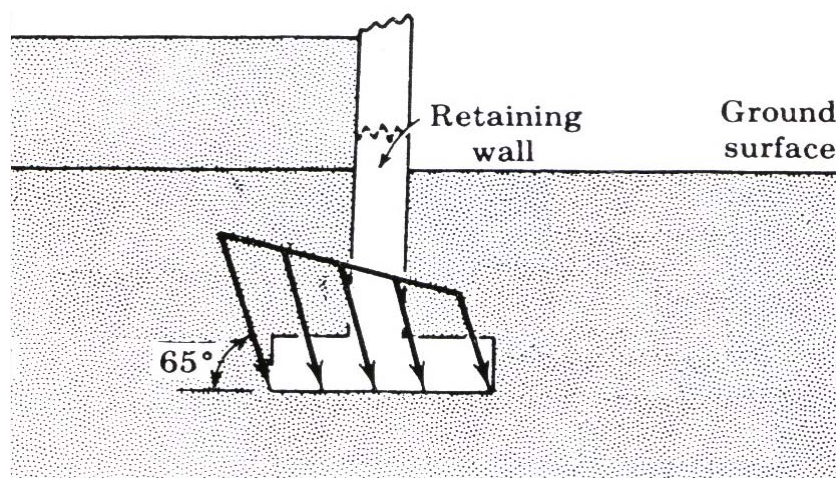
The foundation load in case of an abutment (Harr, 1966)
